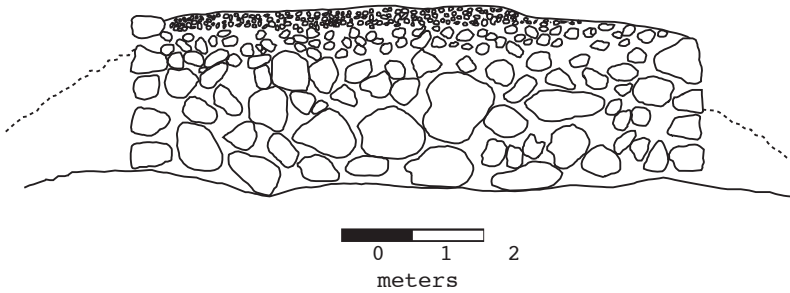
Cross section of Yo'okop's Sacbe 3. (Redrawn by Justine M. Shaw from original illustration by Dave Johnstone)
